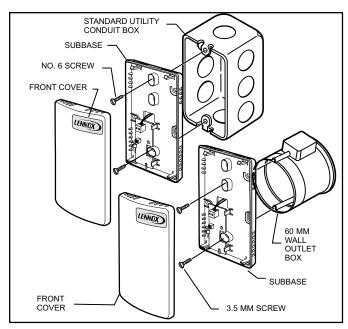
Installing Remote Indoor Sensor on Standard Utility Conduit Box or 60 mm Wall Outlet Box
